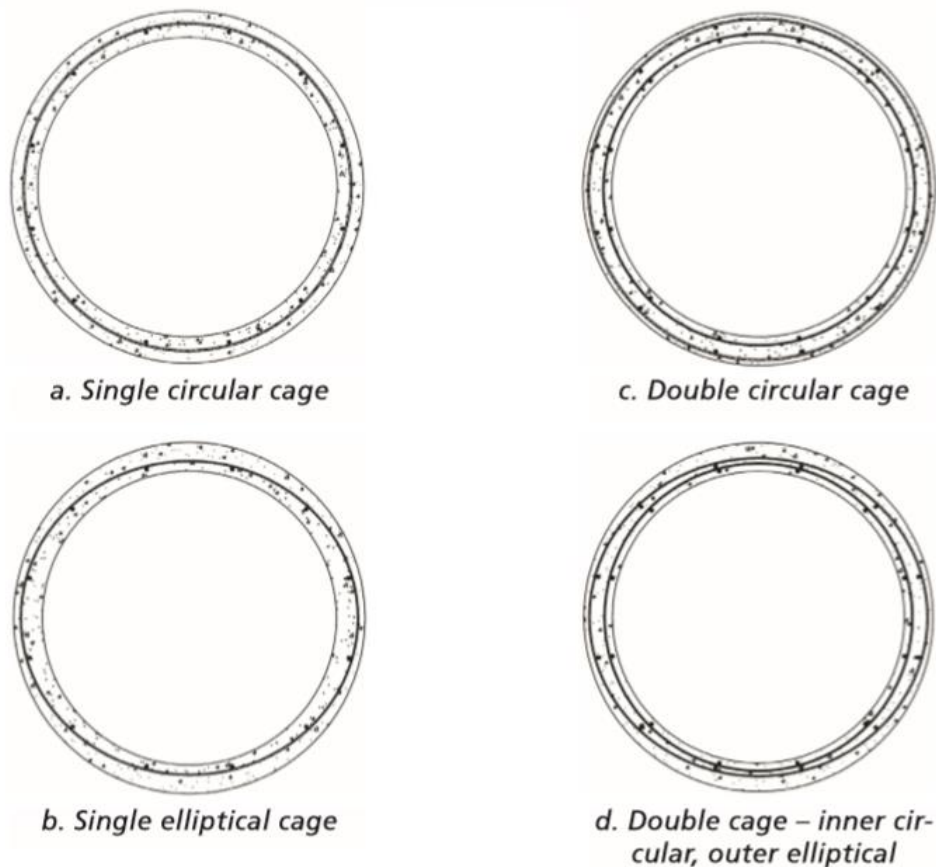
Examples of various steel cage configurations for reinforced concrete pipes in New Zealand (Standards New Zealand, 2007a).
